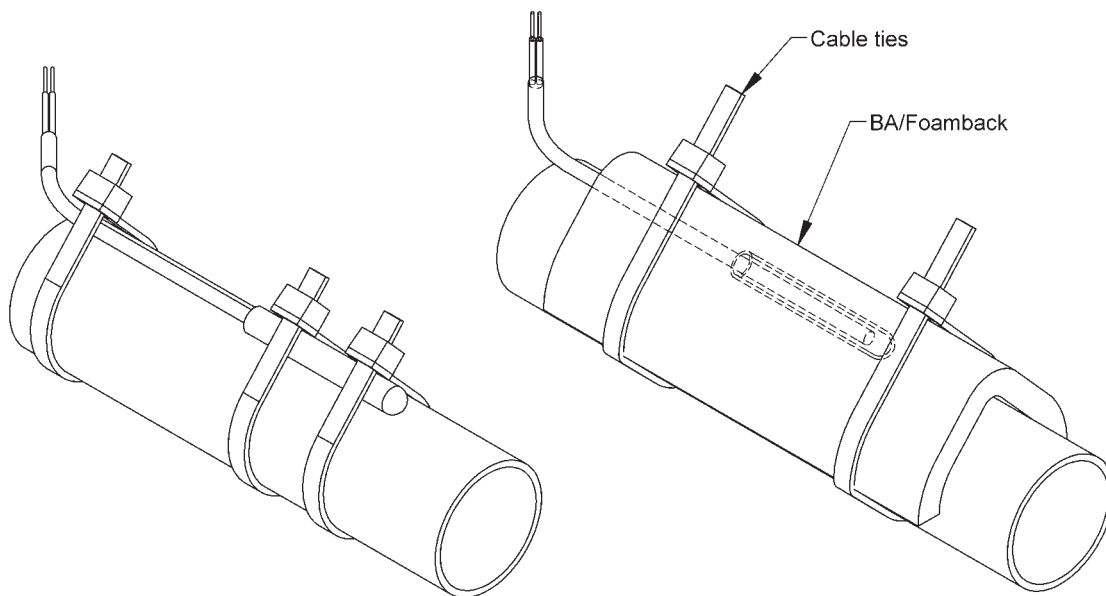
Remote probe with FEP jacketed cable strapped directly to pipe.
